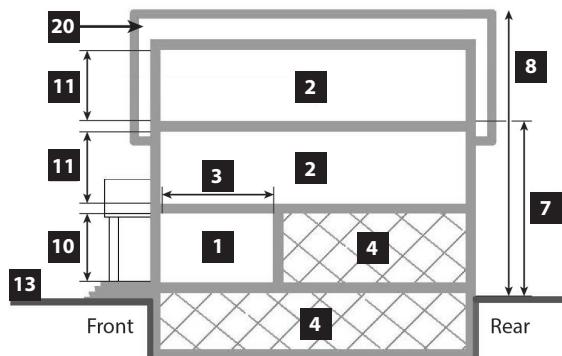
Row building height and use diagram shown with basement and rear building interior parking, porch entry type, and pitched roof type. Not to scale.
